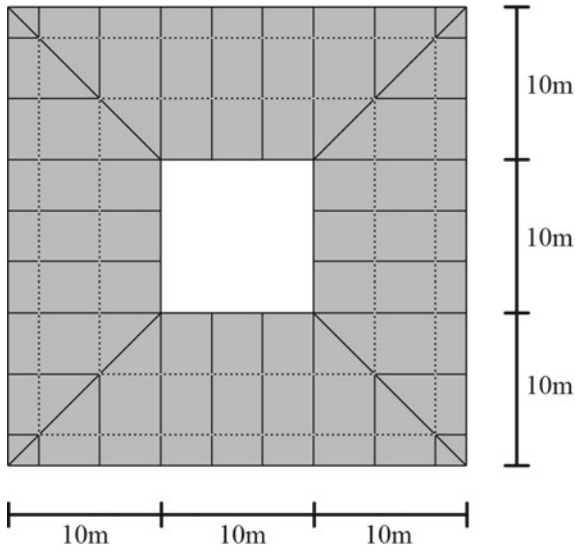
Plan of a diagrid structure with square plan and straight elevation
